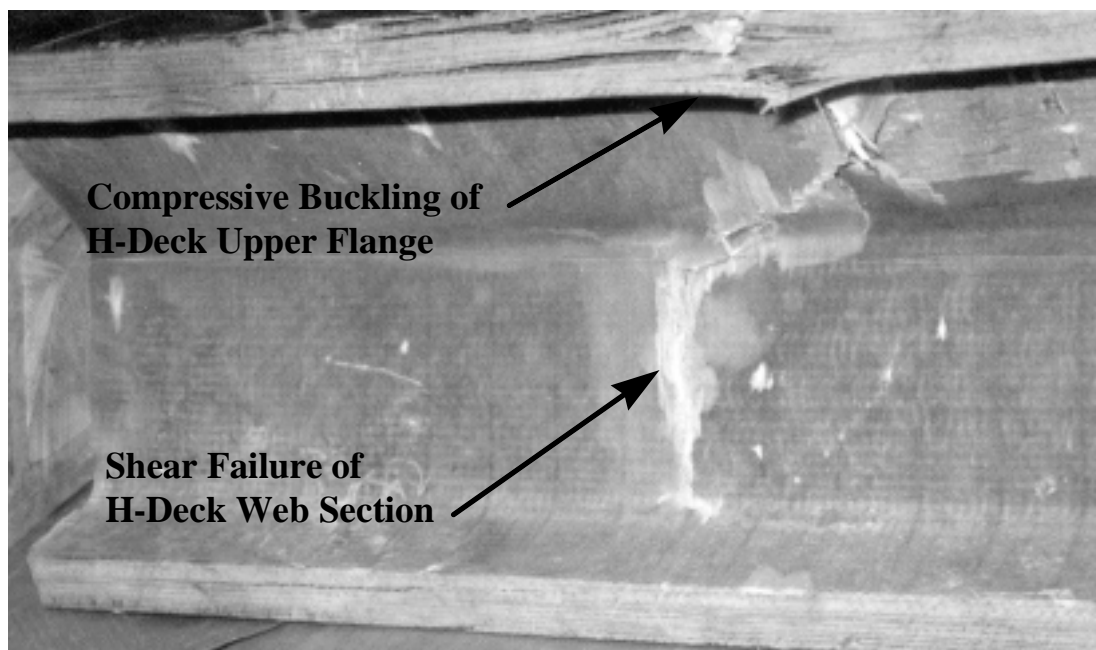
Close-up of VARTM H-Deck after failure showing compressive buckling of upper flange and shear or failure of web section.
